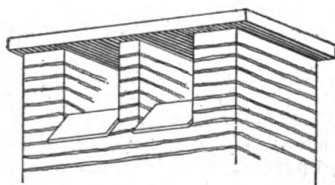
Sometimes the side walls of the chimney are carried up, a stone slab being laid over the top so as to prevent downdraft.
